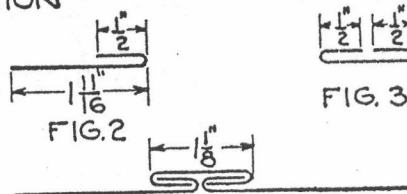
END VIEW OF DRIVE CLEAT CONNECTION
